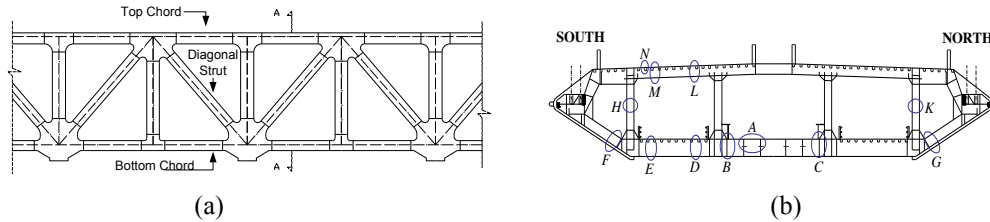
Deck trusses of TMB: (a) elevation view; (b) cross-section view
